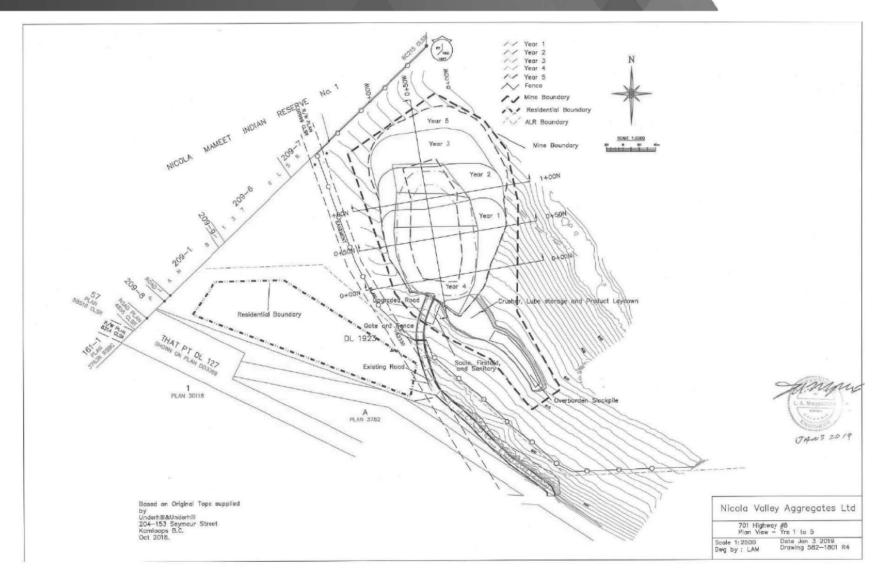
NVA Pit Site Plan - Scale: 1:2500
